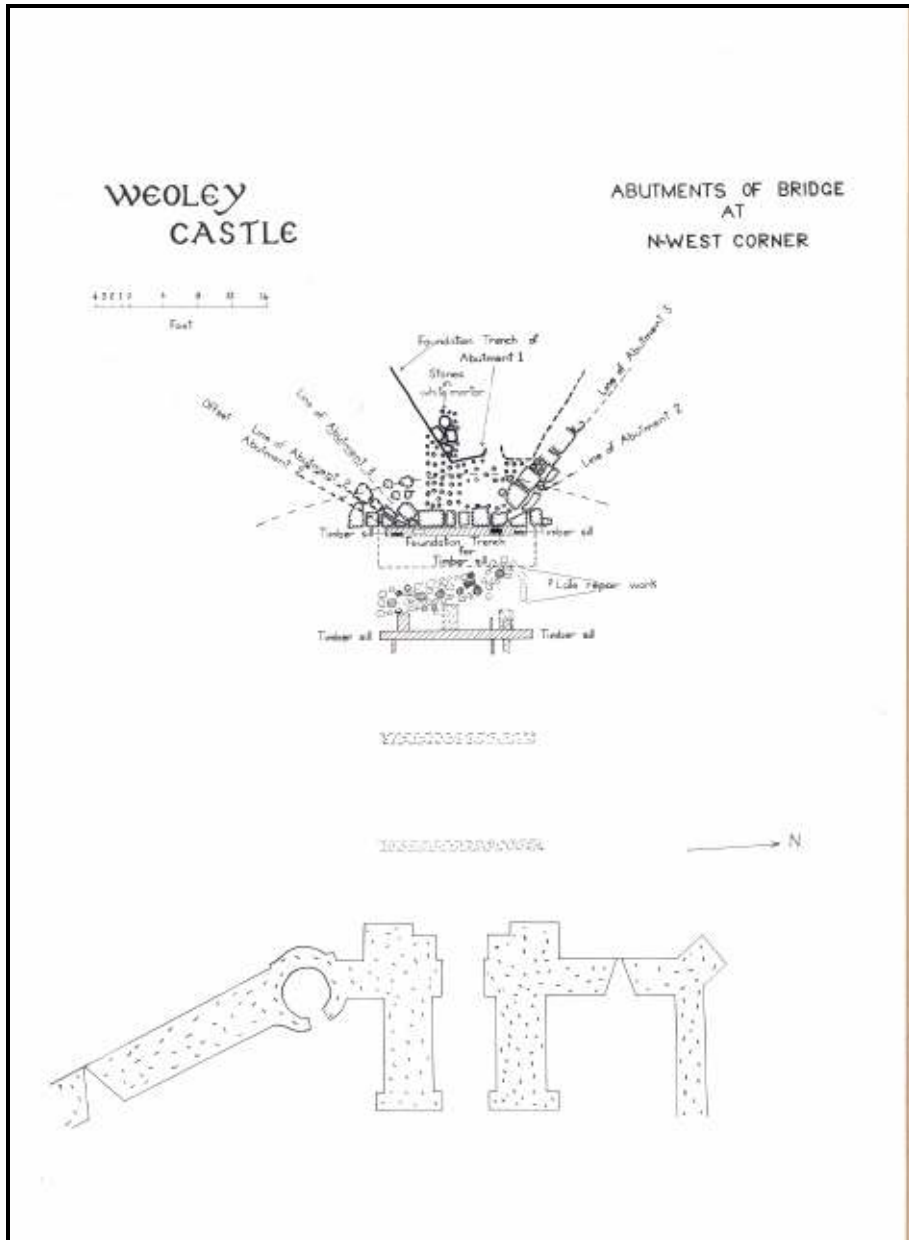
Plan of Northwest Bridge and abutments (Scan 042)
